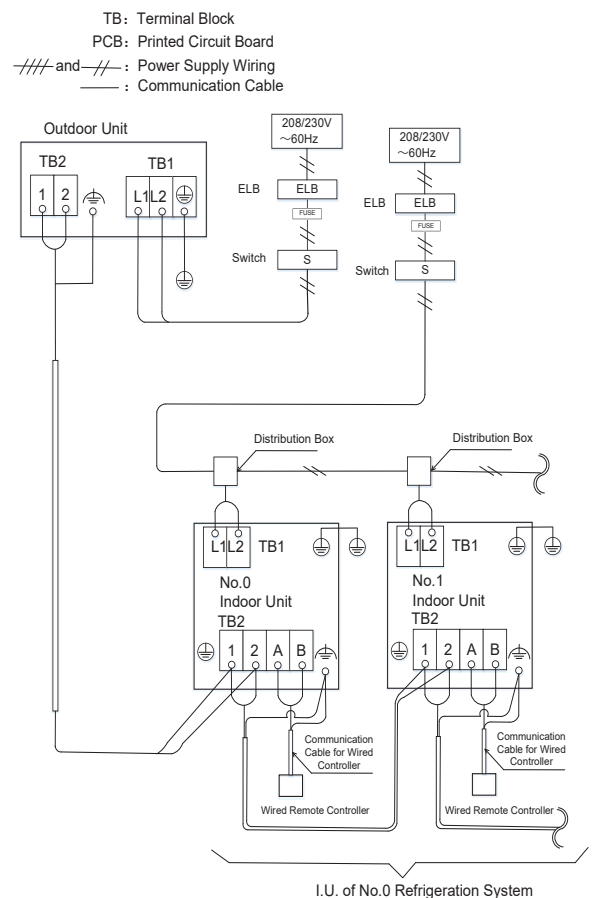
(a) Wiring connection for indoor & outdoor
